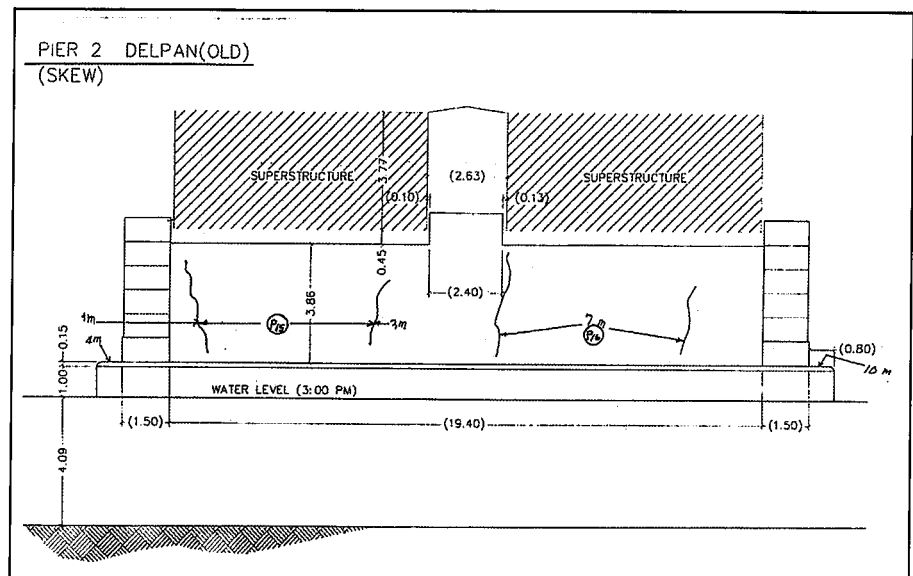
Visual Inspection Sheet 3 of 3 (Crack Sheet)
